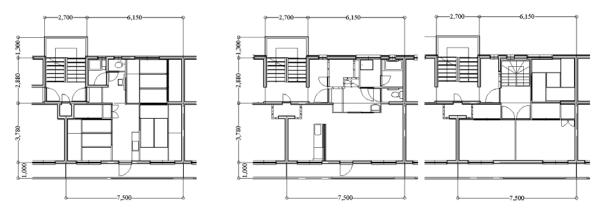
Dwelling Units Plans Before and After Flats into Duplex, Original Dwelling Unit Plan, Lower Floor Plan and Upper Floor Plan of Duplex
